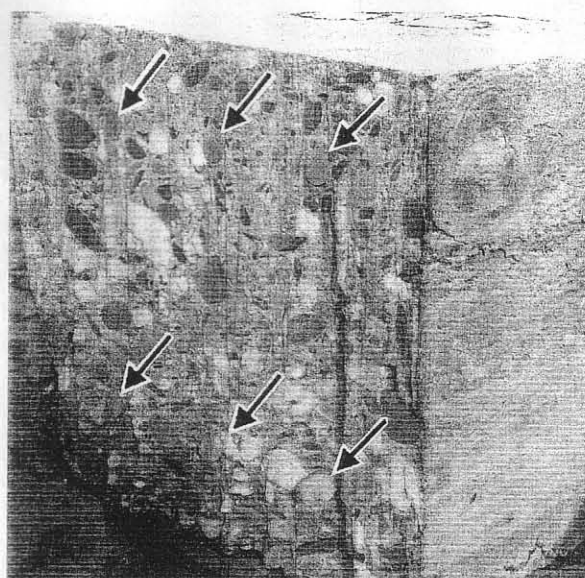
Steel-bar reinforced concrete member, separated by HAE (reinforcement bars are marked; member height, 33 cm). Photograph: WOMA Apparatebau GmbH, Duisburg.
